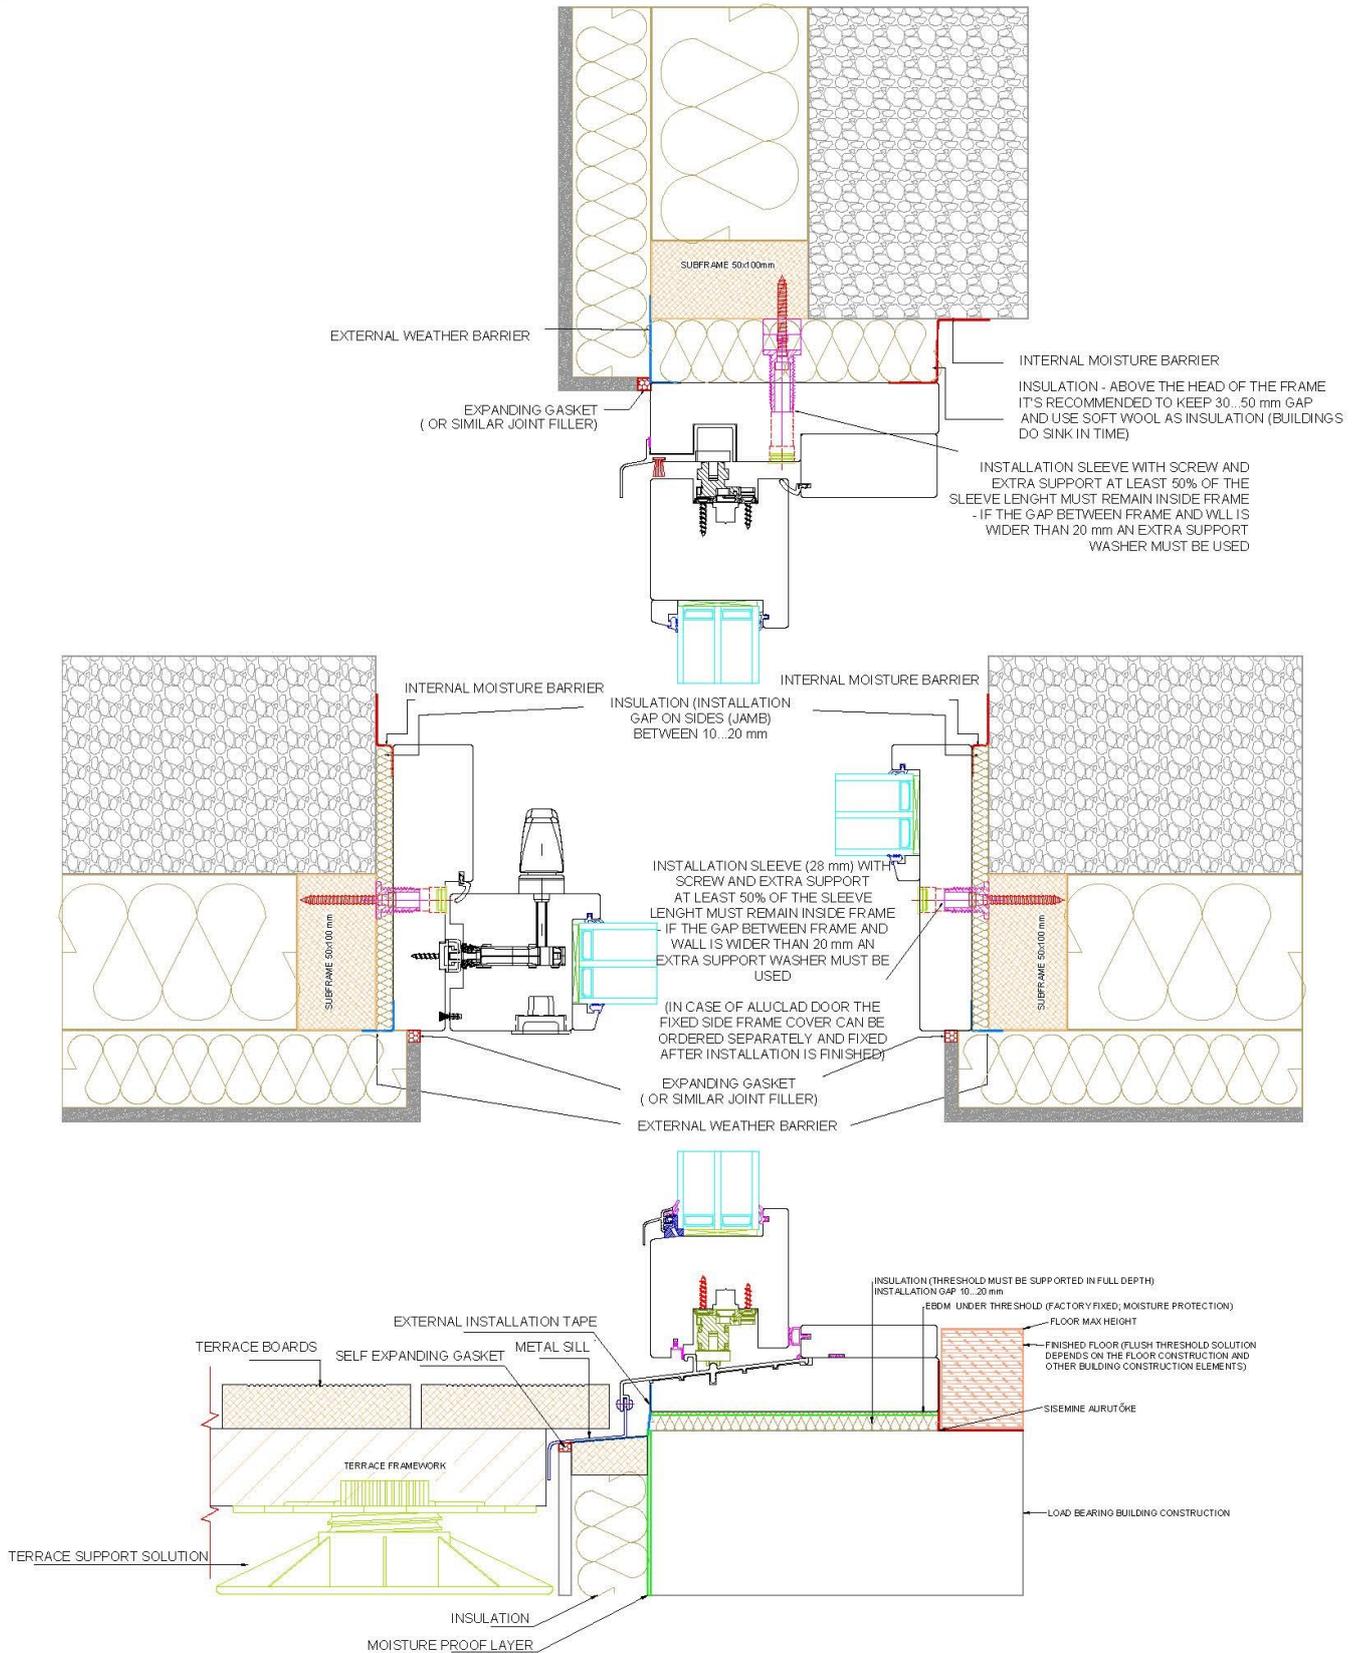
The installation schemes of external door set (by way of example of SW17 panel door)
